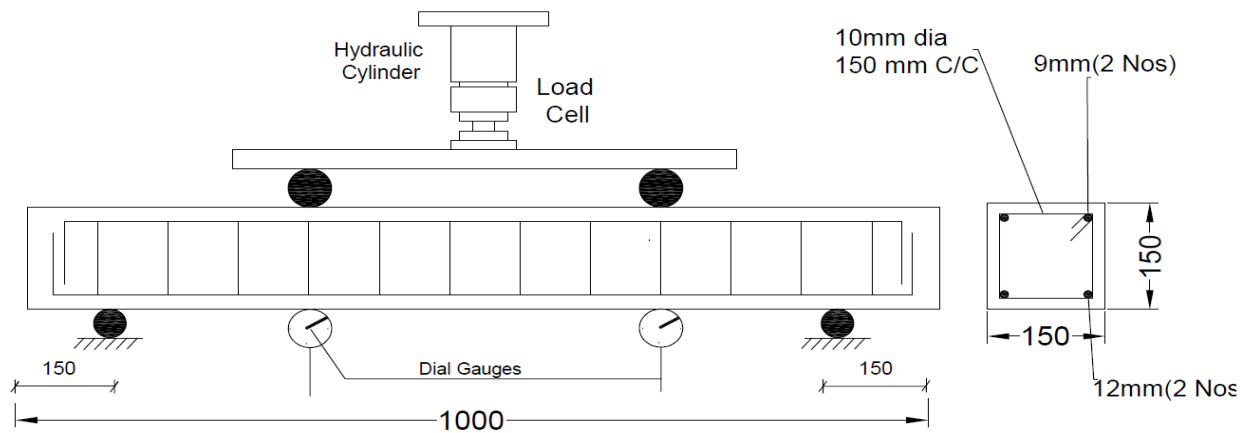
Test set up and reinforcement details (dimensions are in mm)
